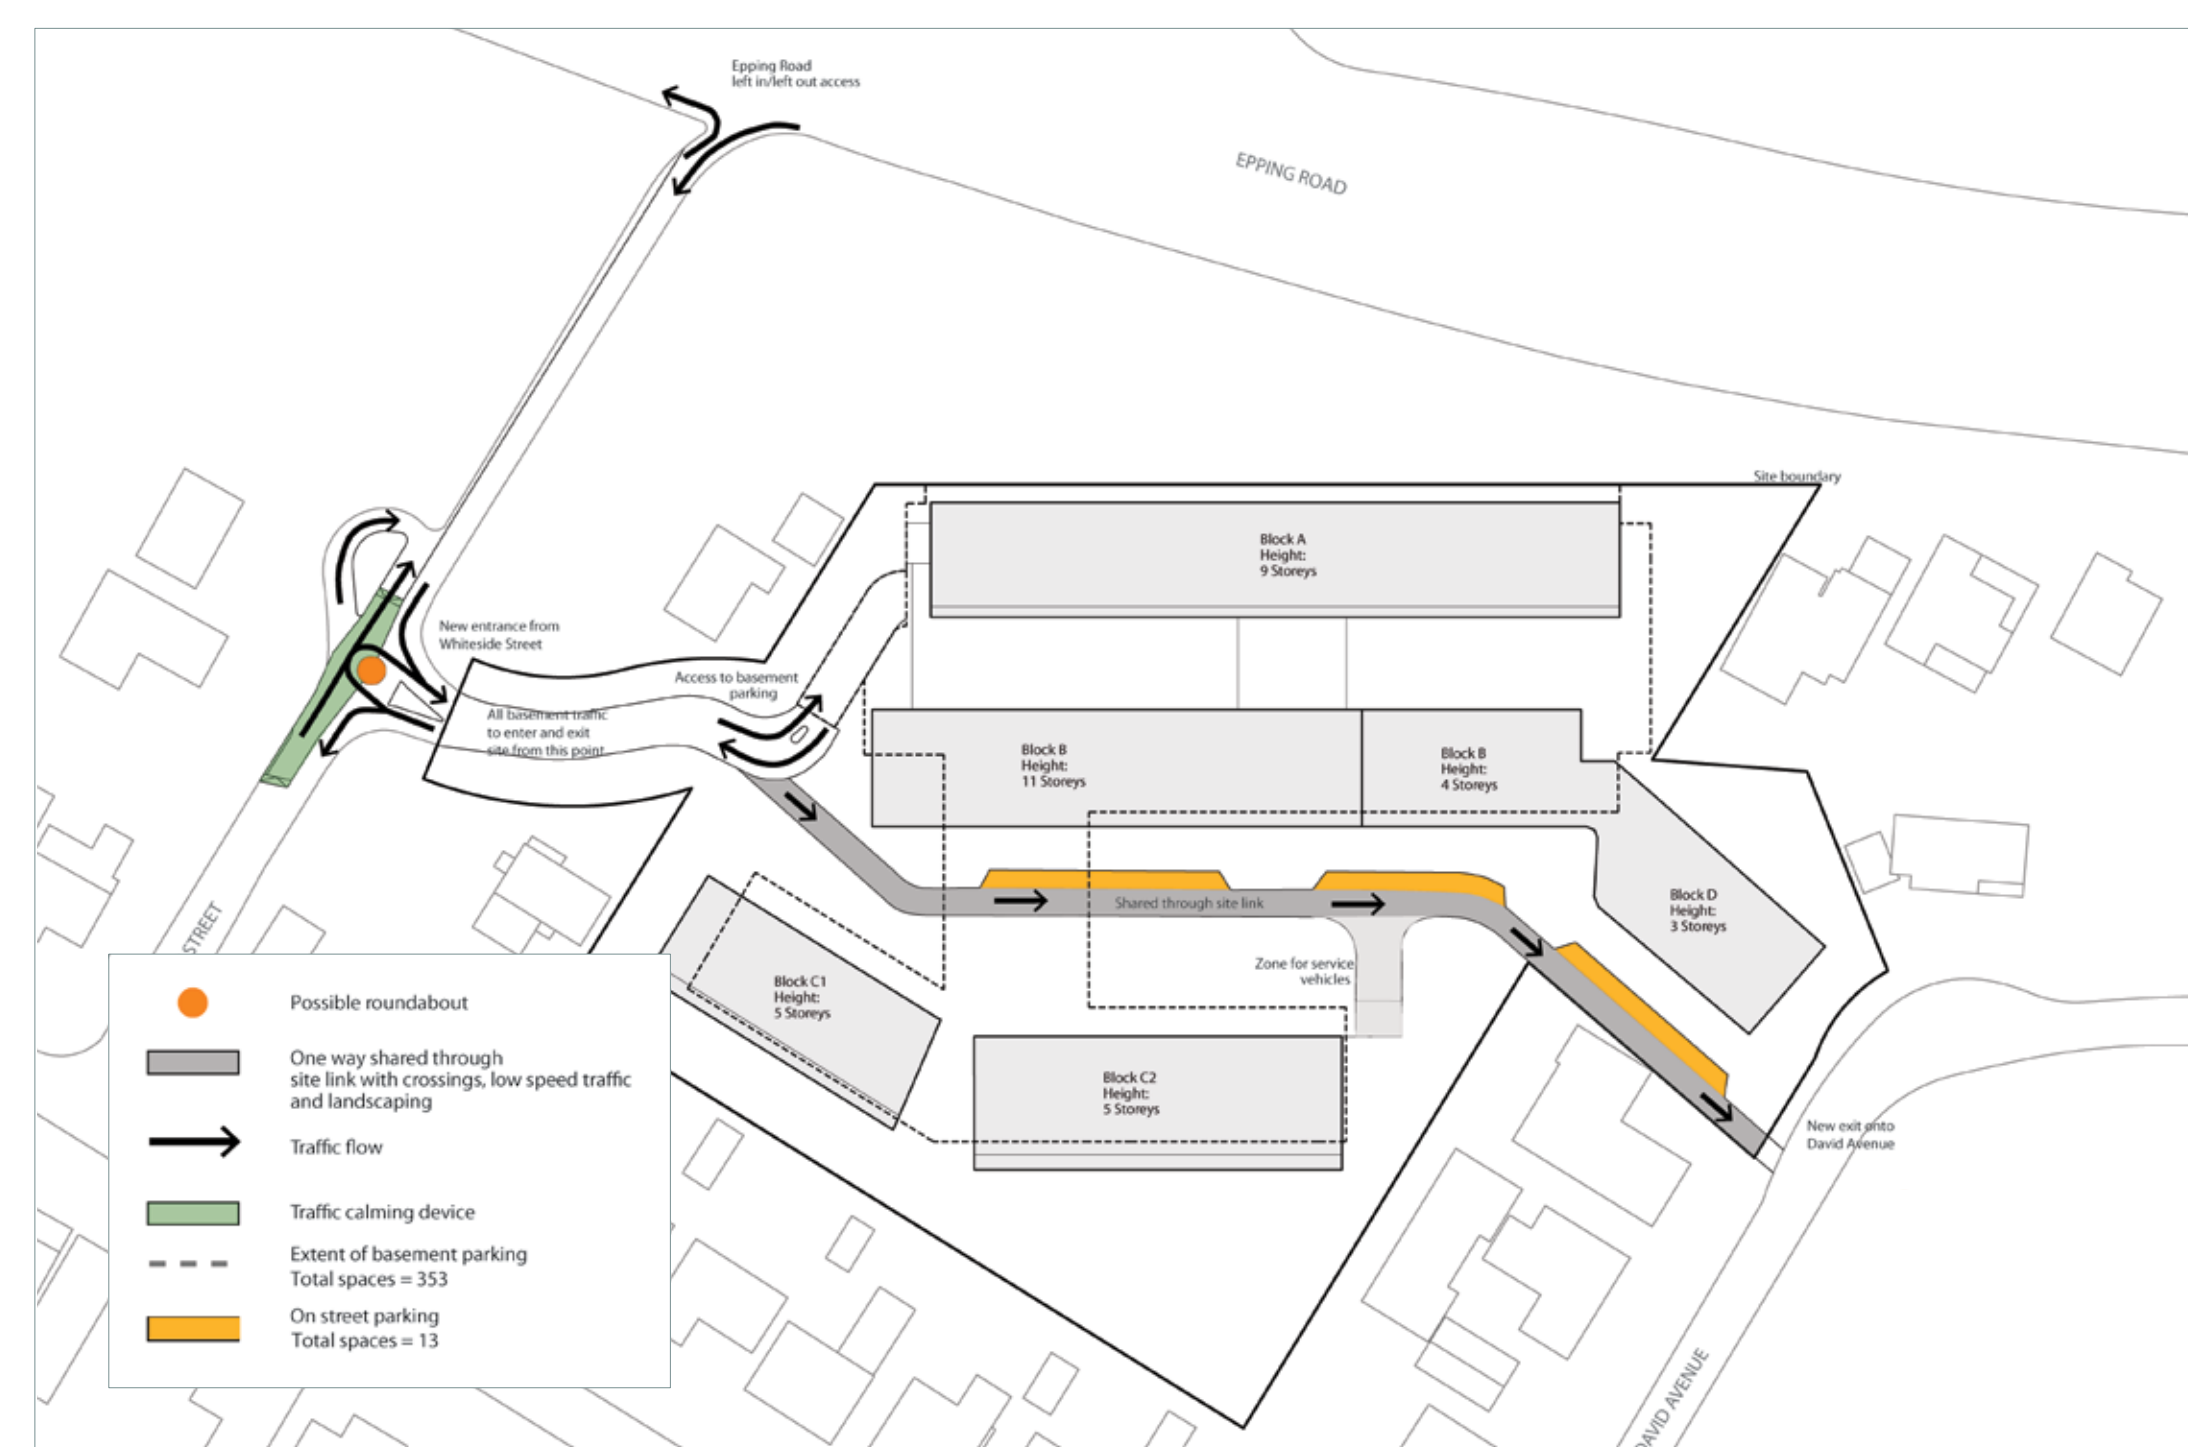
PROPOSED TRAFFIC AND PARKING ARRANGEMENTS
